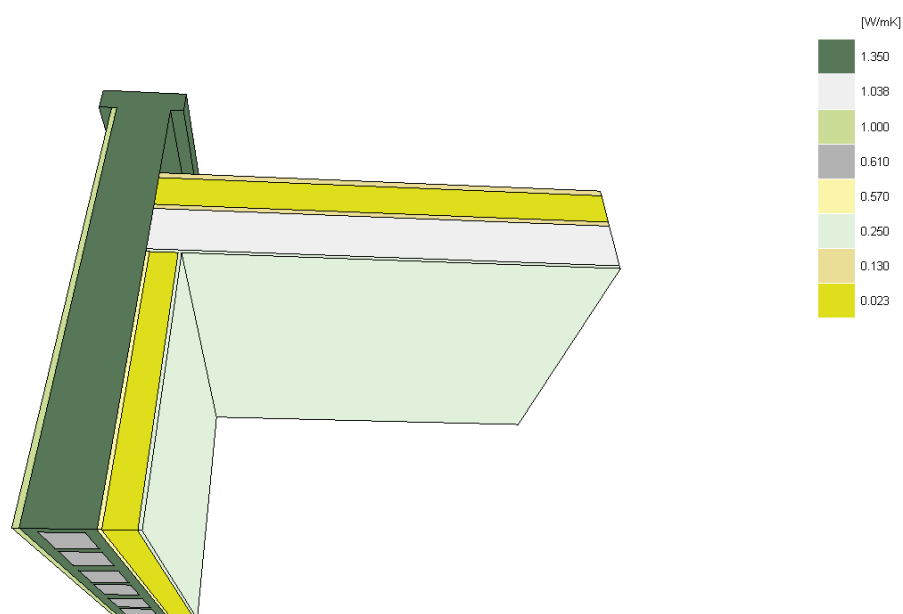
Hollow block wall with IWI, junction with flat warm roof and parapet: Materials modelled in TRISCO
